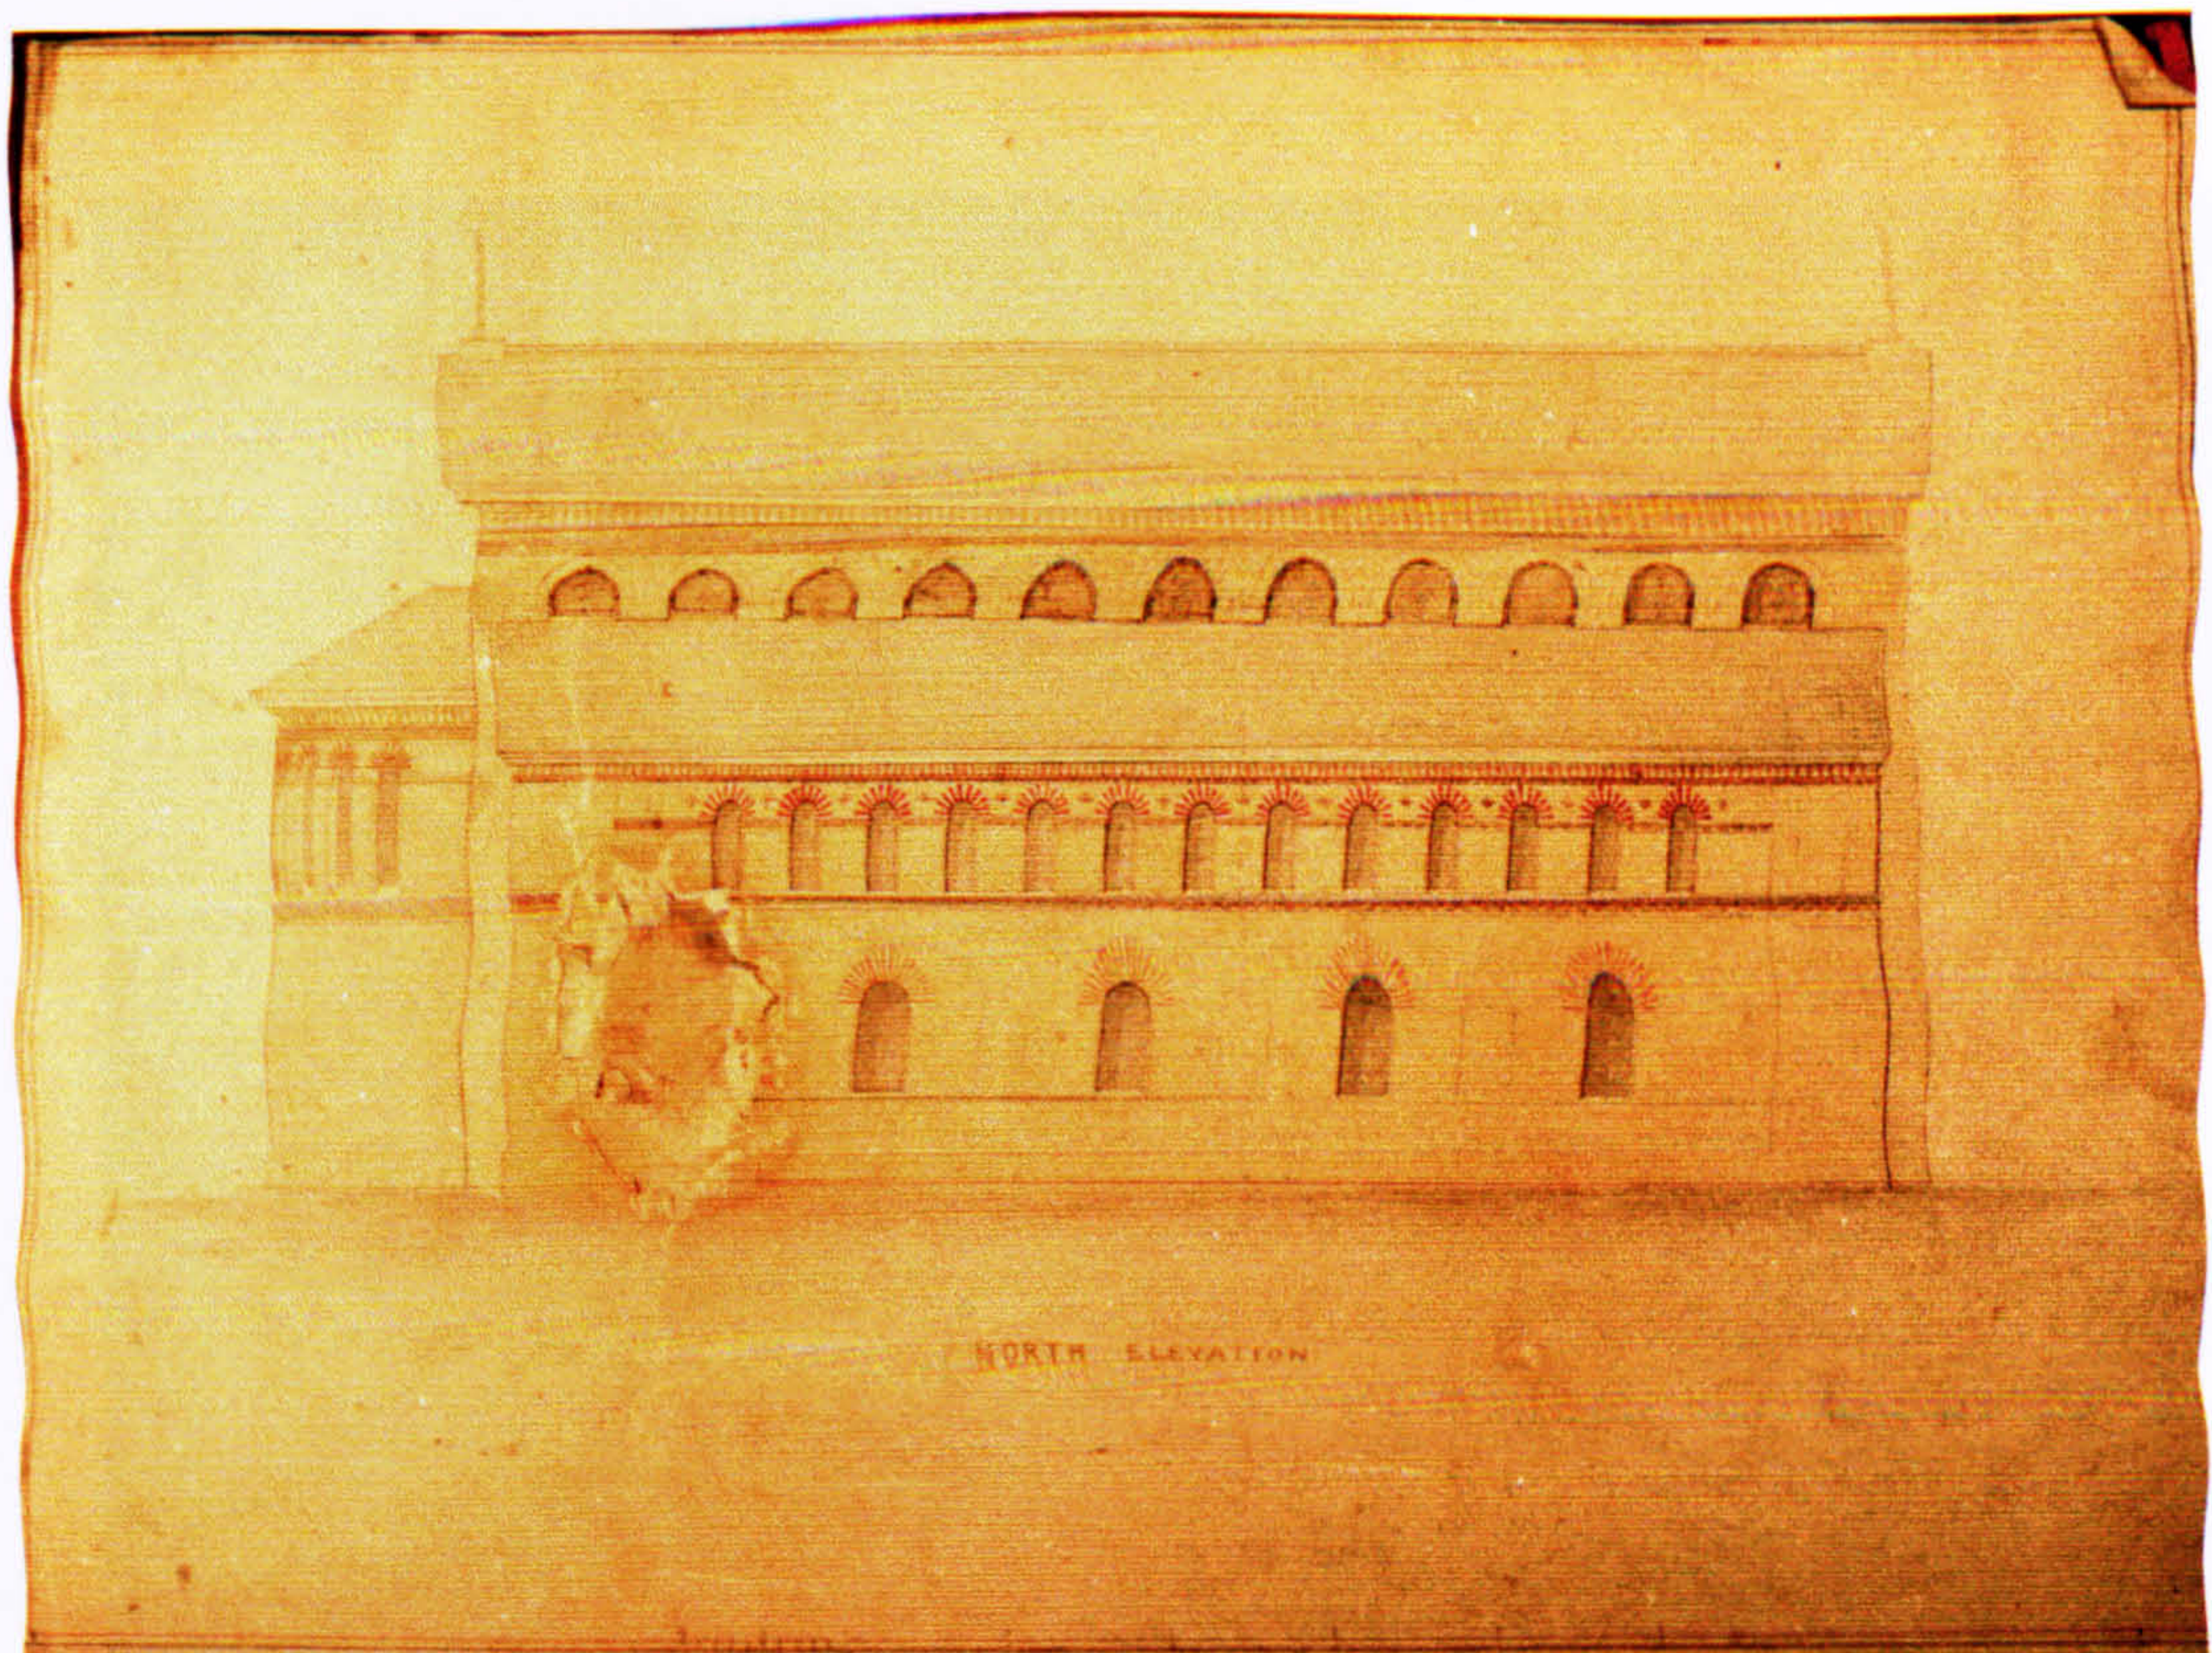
Christchurch Streatham: drawing of north elevation from contract set
